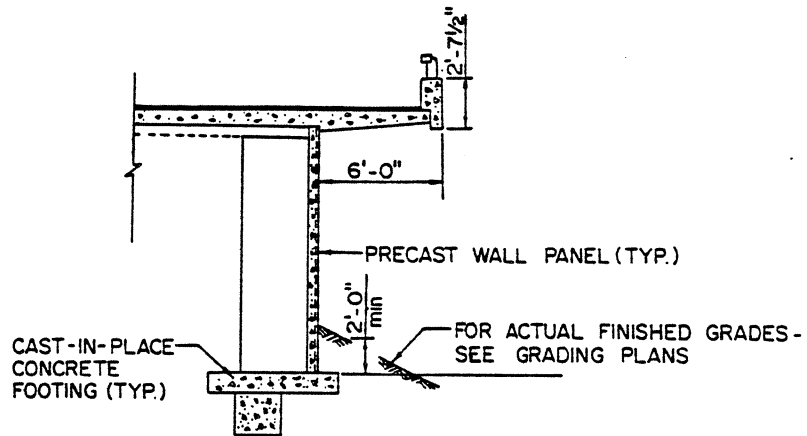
Precast wall with cast-in-place post-tensioned slab.
